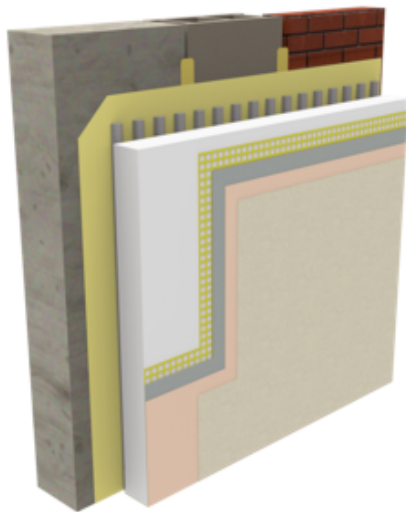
StoTherm®ci over concrete, concrete masonry unit and masonry
